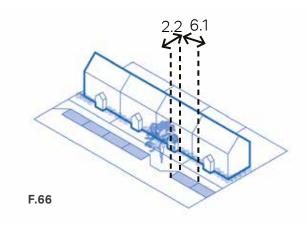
Illustrative diagram showing an indicative layout and minimum dimensions of on-street parking
